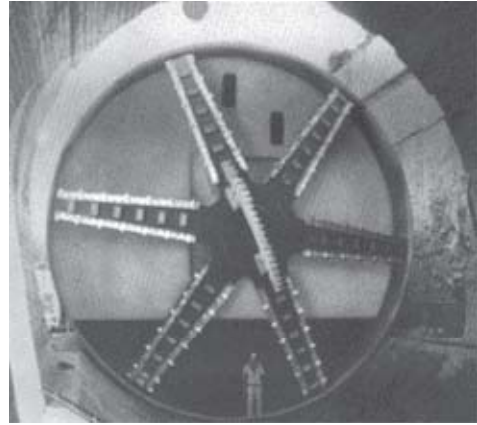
The TBM for excavating the Aurelia tunnel.
